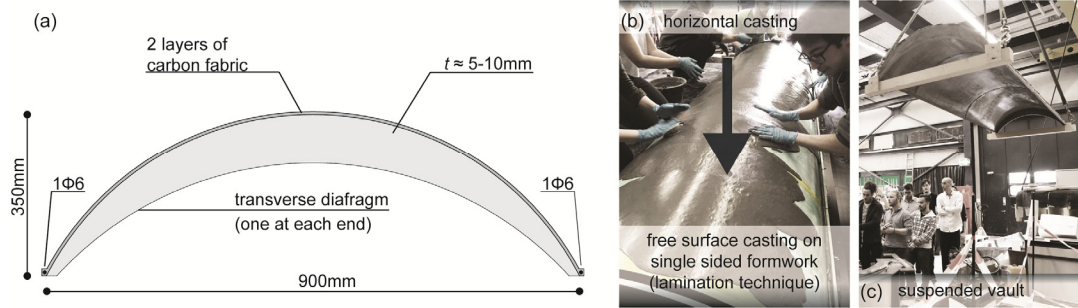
TRC barrel shell vault: a) cross section, b) construction, c) suspended vault.
